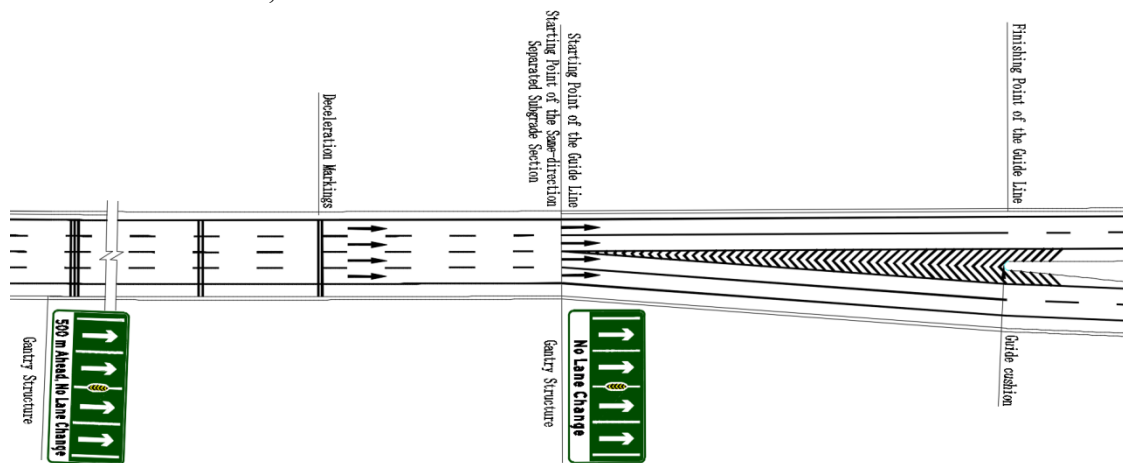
Layout of safety facilities for the same-direction separated subgrade section
